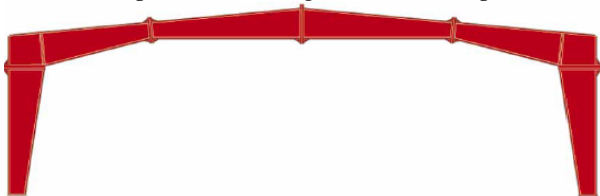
Built-Up "I" Shaped Primary Structural Framing Members.
